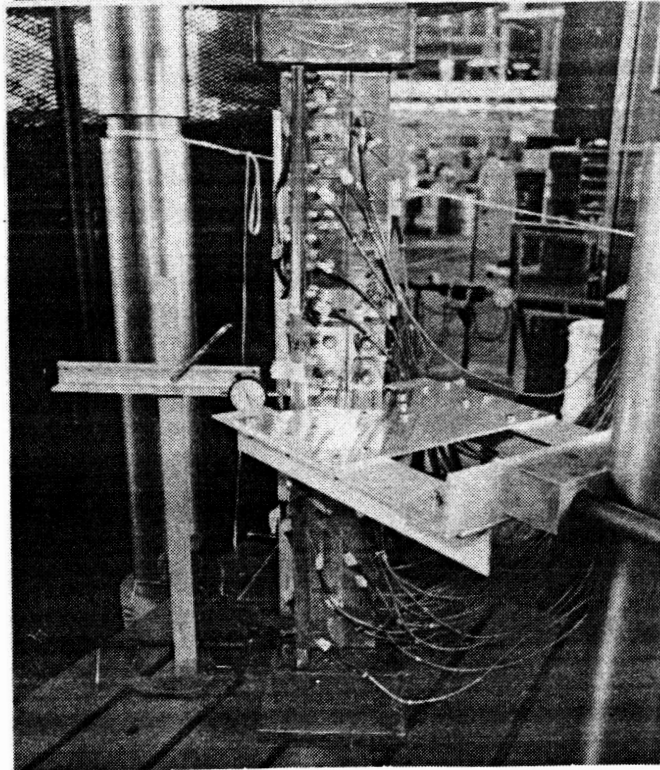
Instrumented CS4 Specimen Installed in Universal Testing Machine
